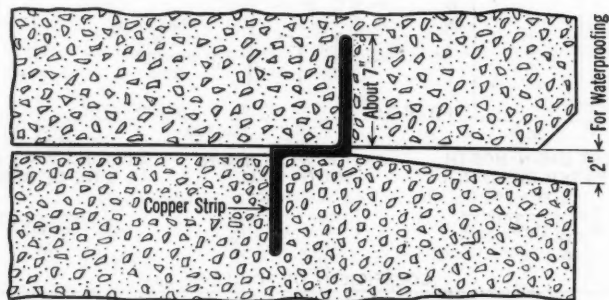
SUGGESTION FOR PLACING CONTINUOUS VERTICAL COPPER STRIP AT EXPANSION JOINTS ON FACE OF WALLS.
